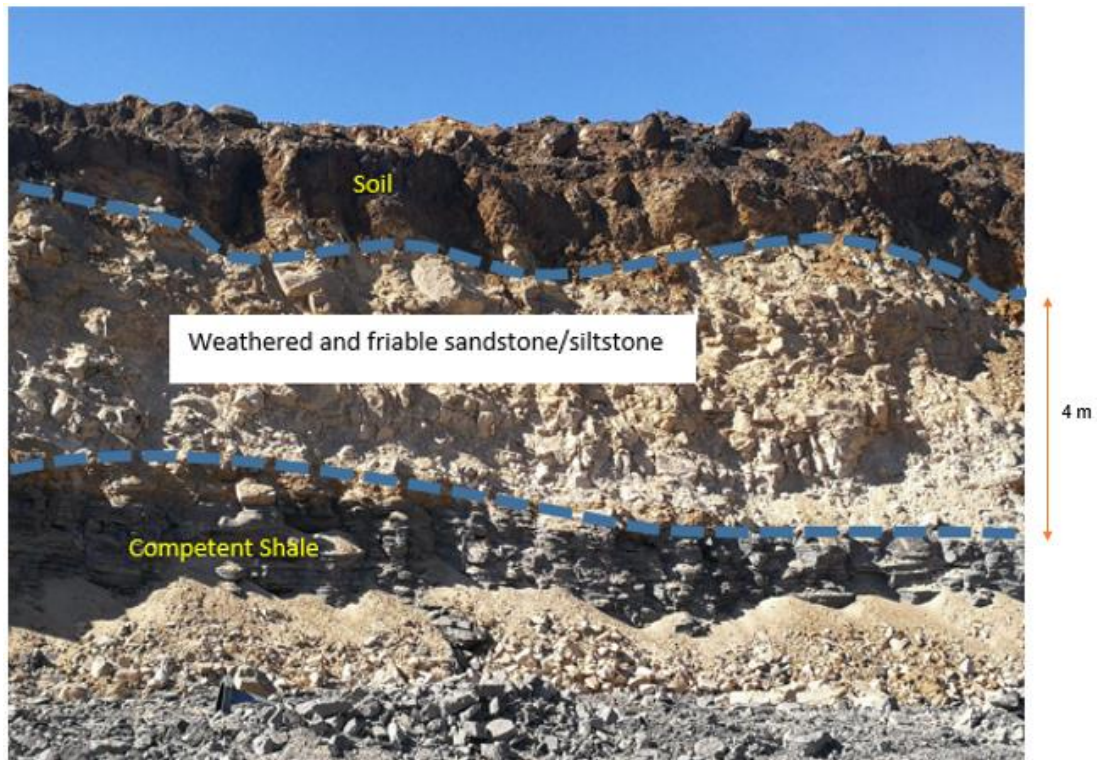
Typical Highwall weathering horizons South Pit (S5_S6 ramp)
